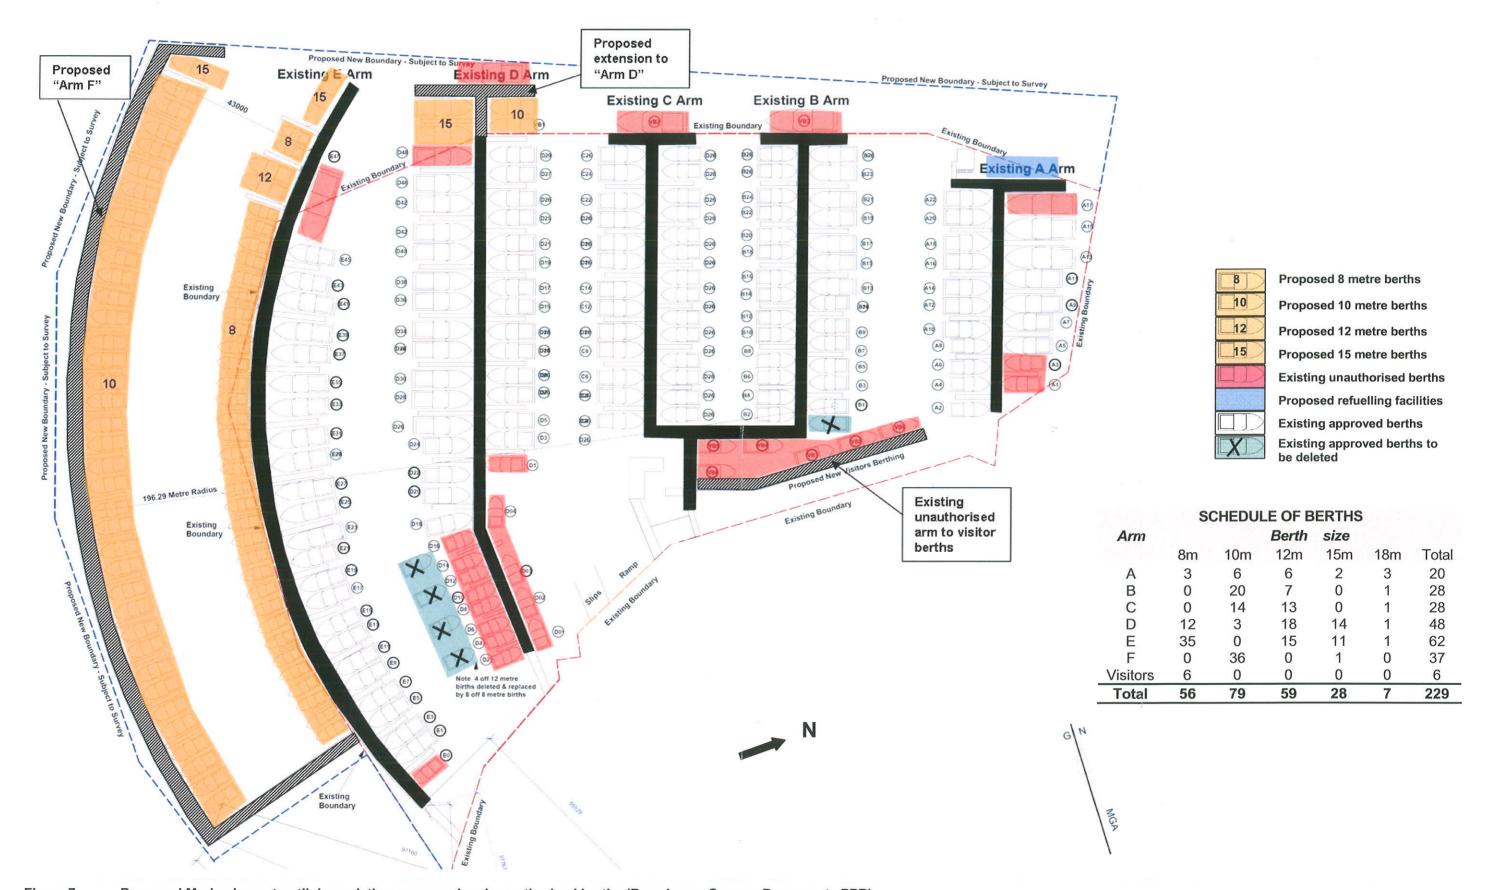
Proposed Marina Layout outlining existing, proposed and unauthorised berths (Base Image Source: Proponents PPR)
